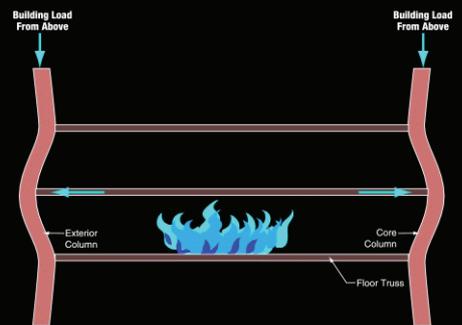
Expansion of floor slabs and framing results in outward deflection of columns and potential overload.
